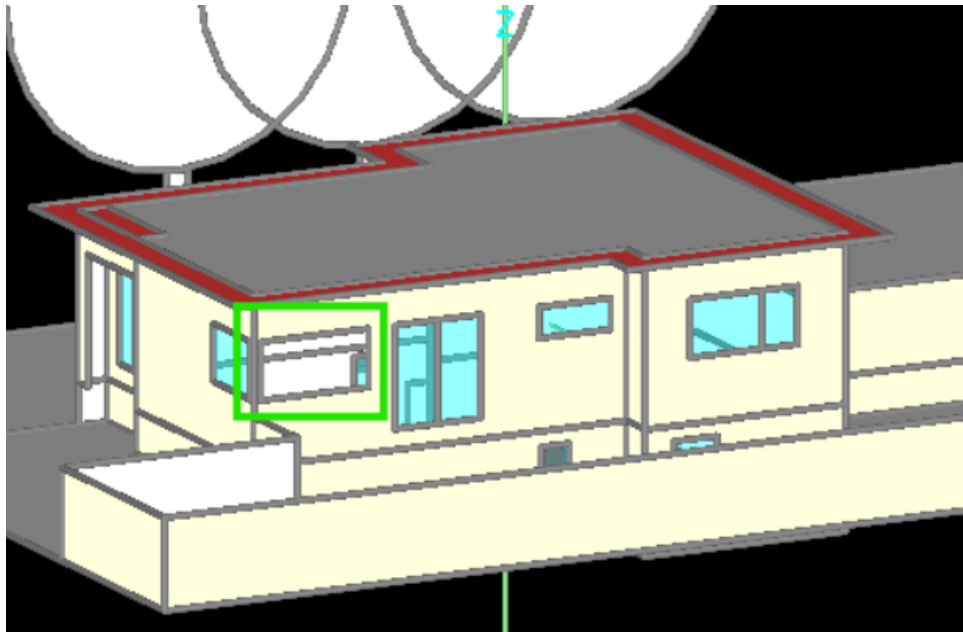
One surface was not imported from SketchUp to WUFI; this surface can be redrawn in WUFI Passive per [Section 3.4](#).
